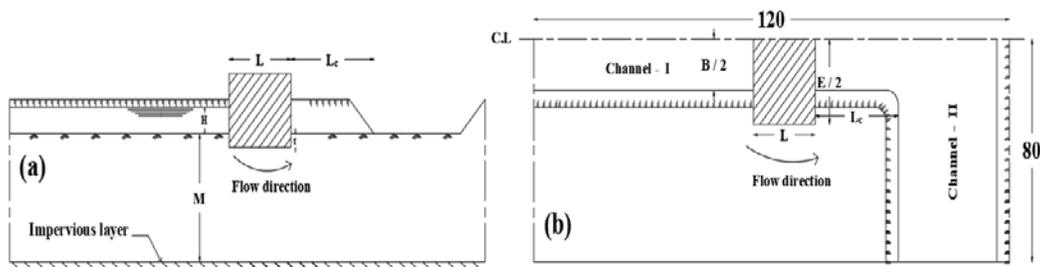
Schematic sketch of the physical problem in the 3D verification (a) section elevation (b) half plan
